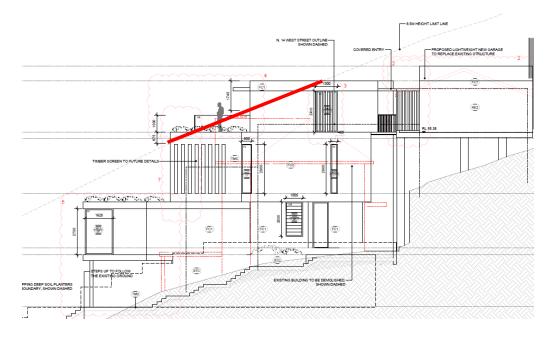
North elevation plan extract showing 8.5 metre building height standard breaching elements
